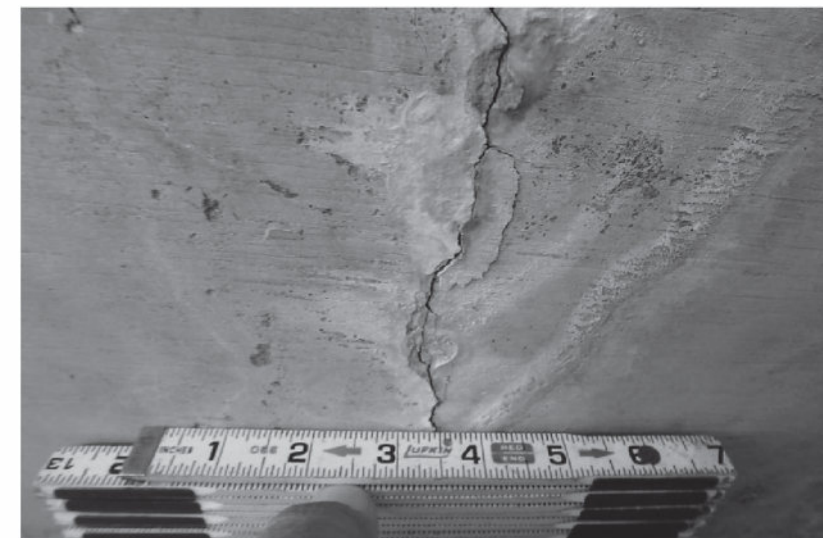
TYPICAL MINOR TO MODERATE LONGITUDINAL CRACKING IN SOFFIT OF FLAT SLABS.
